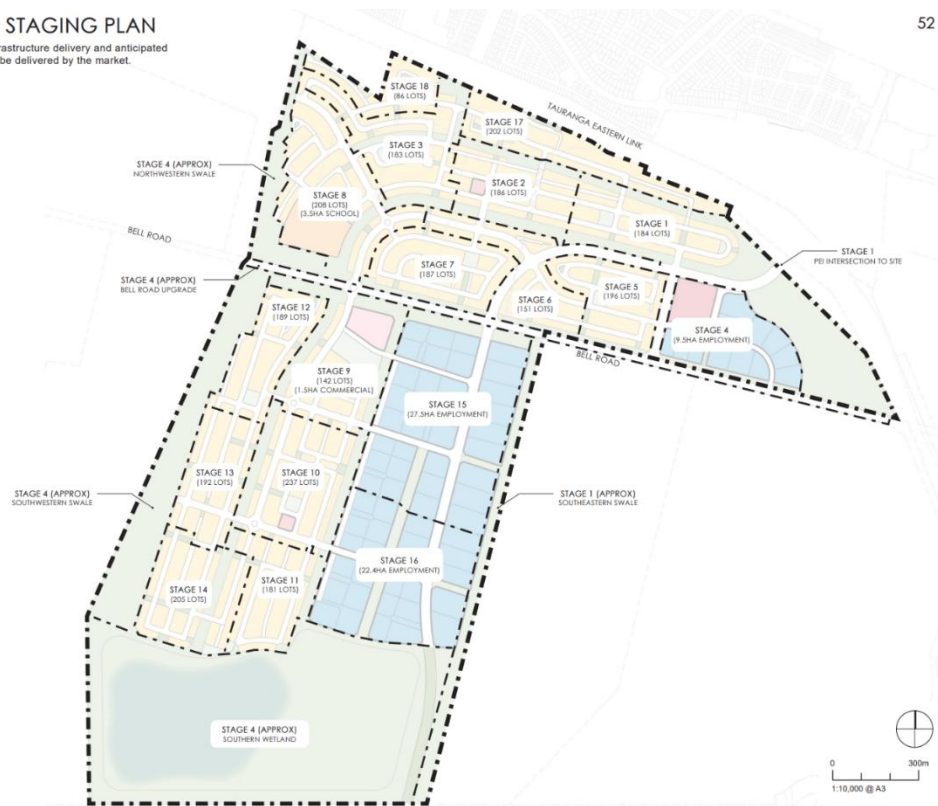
Preliminary Staging Plan (Source: AEE Appendix C – Master Plan Figure 5.7)
